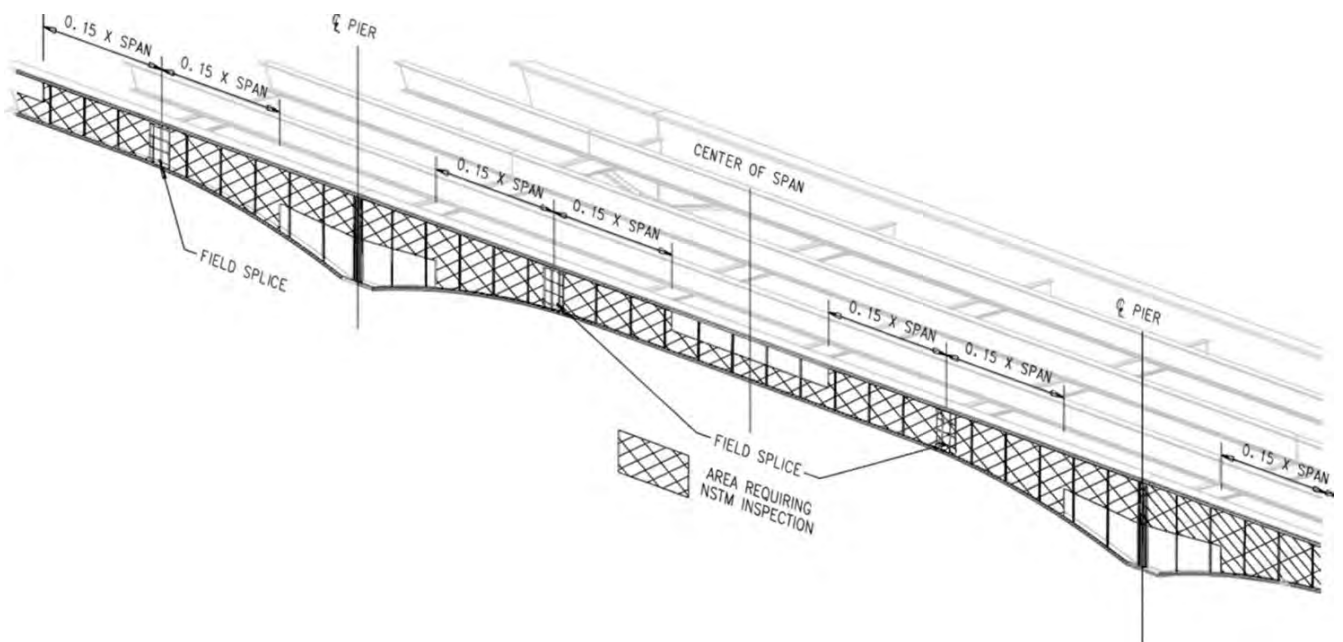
Main Girder Inspection with Field Splices.
